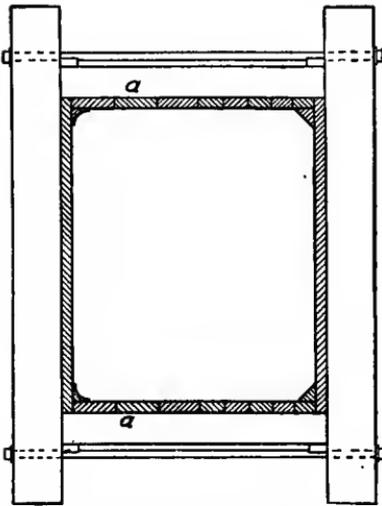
FORM FOR RECTANGULAR COLUMN.
